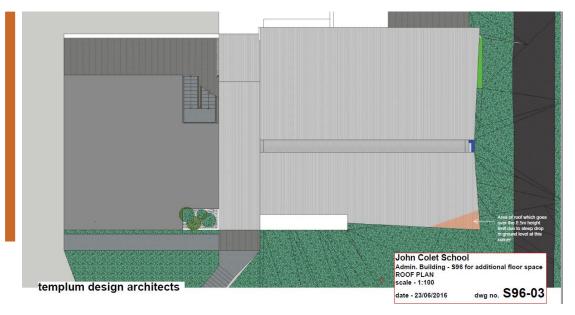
Proposed Roof Plan, showing location of roof non-compliance with height standard (Source: Templum)
